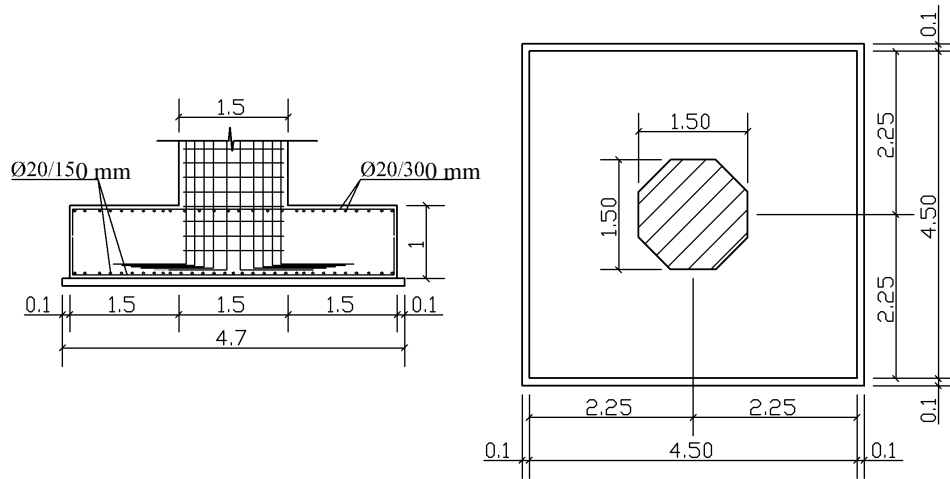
Alnasha Bridge Pier #2 and Pier #3 spread footing details (Dimensions in meter).
